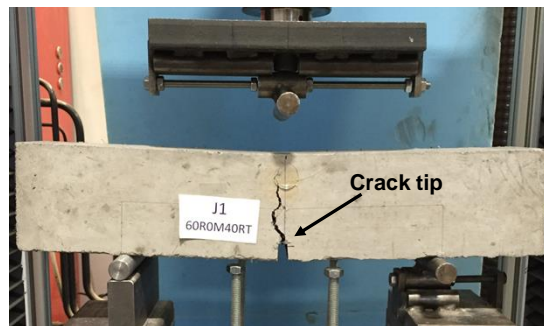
Photograph showing a typical flexural failure of the tested concrete prisms
